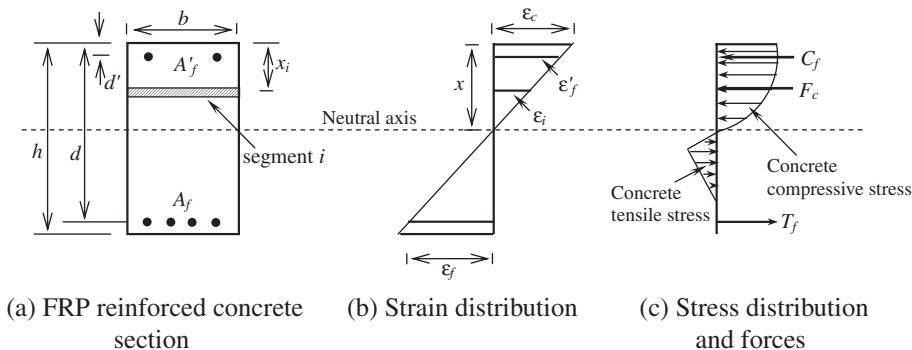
Strains, stresses and forces of a reinforced concrete section.
